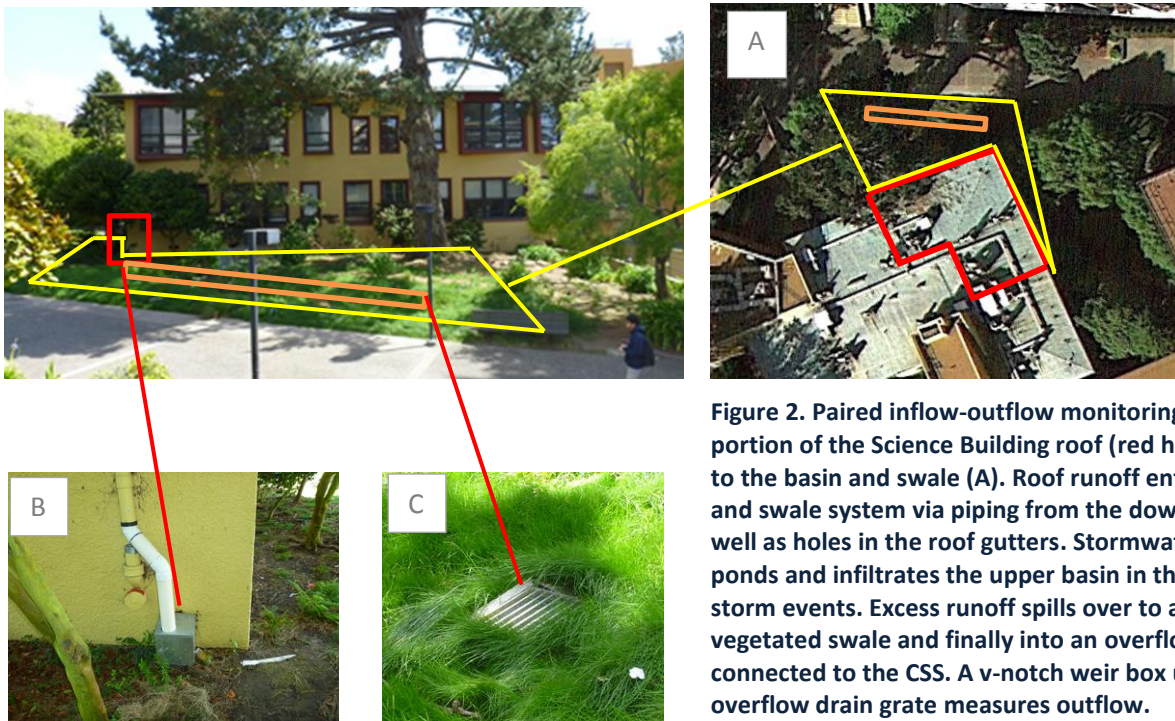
Paired inflow-outflow monitoring design. A portion of the Science Building roof (red highlight) drains to the basin and swale (A). Roof runoff enters the basin and swale system via piping from the downspout (B) as well as holes in the roof gutters. Stormwater runoff ponds and infiltrates the upper basin in the system during storm events. Excess runoff spills over to a sloped, vegetated swale and finally into an overflow drain (C) connected to the CSS. A v-notch weir box under the overflow drain grate measures outflow.
